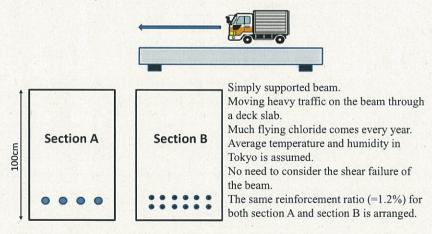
Reinforced concrete beam subjected to moving traffic loads
